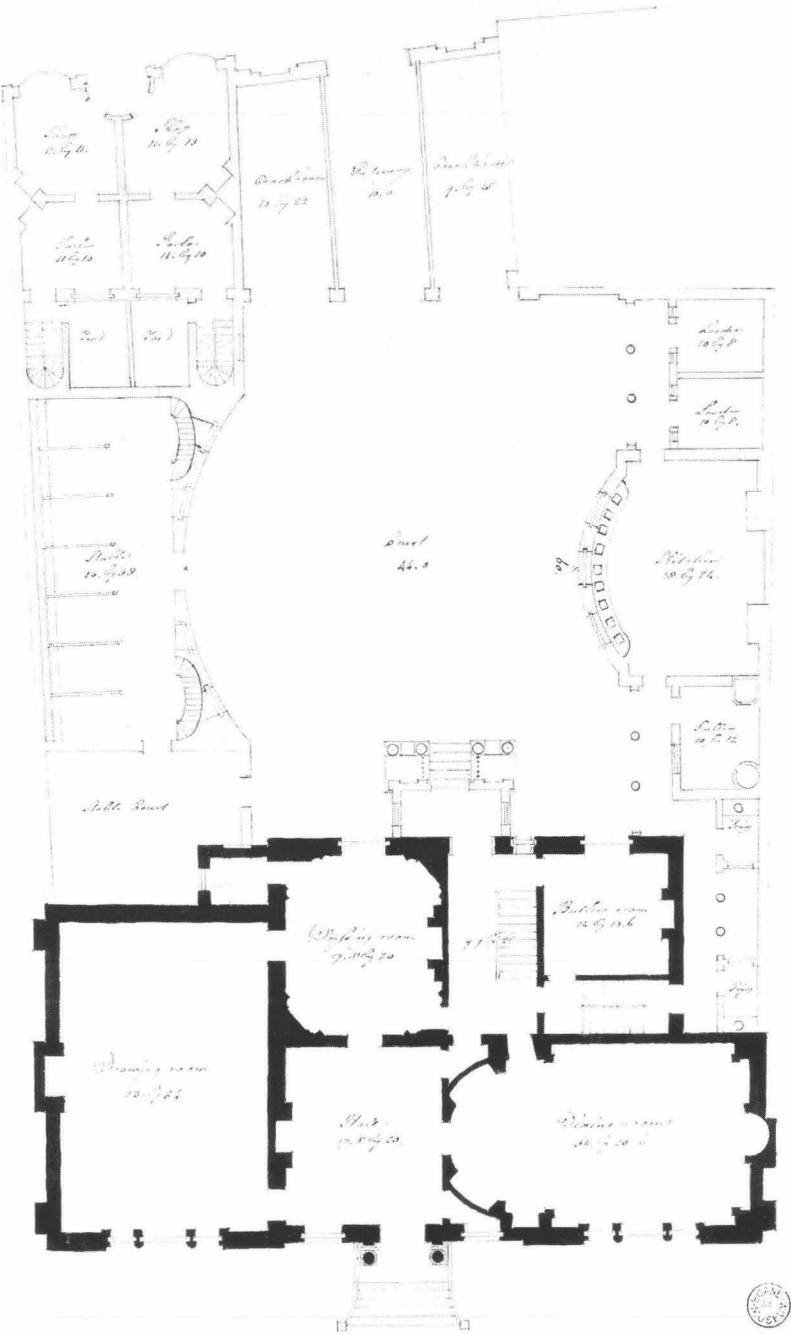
Robert Adam, ground plan of Marlborough House and proposals for the outbuildings and courtyard to the rear, or west, 1786, pen. (Source: Sir John Soane's Museum.)
